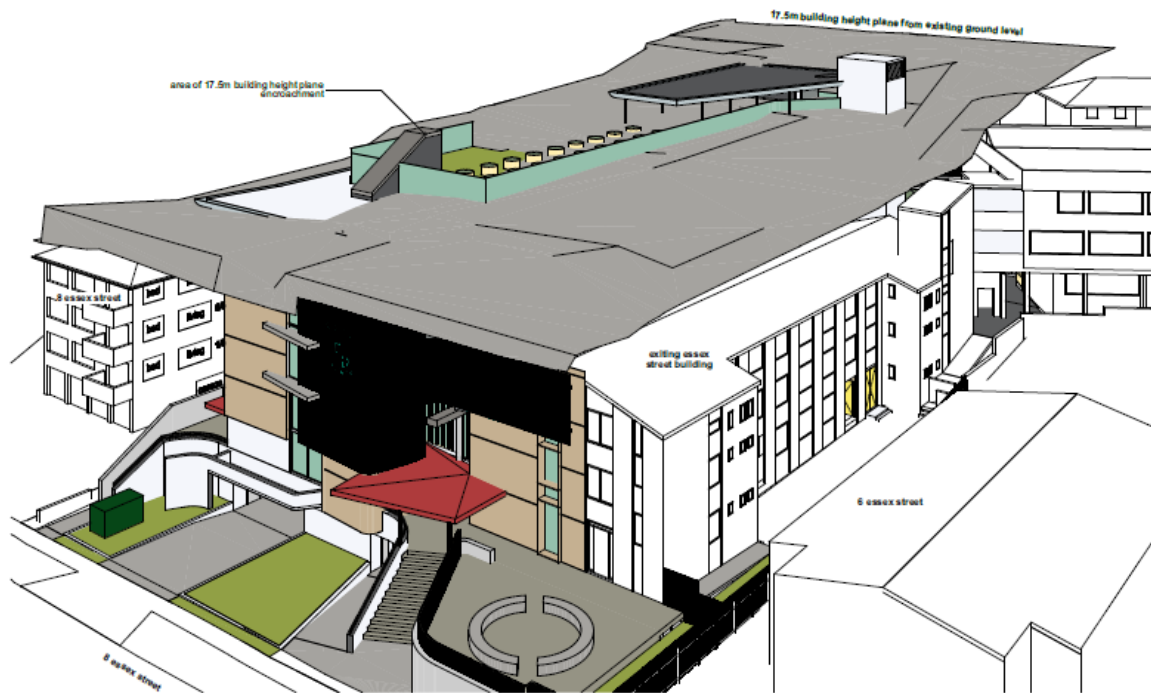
Building height breaches (structures above the grey height plane) of the new school building. *Source: Stanton Dahl Architects
